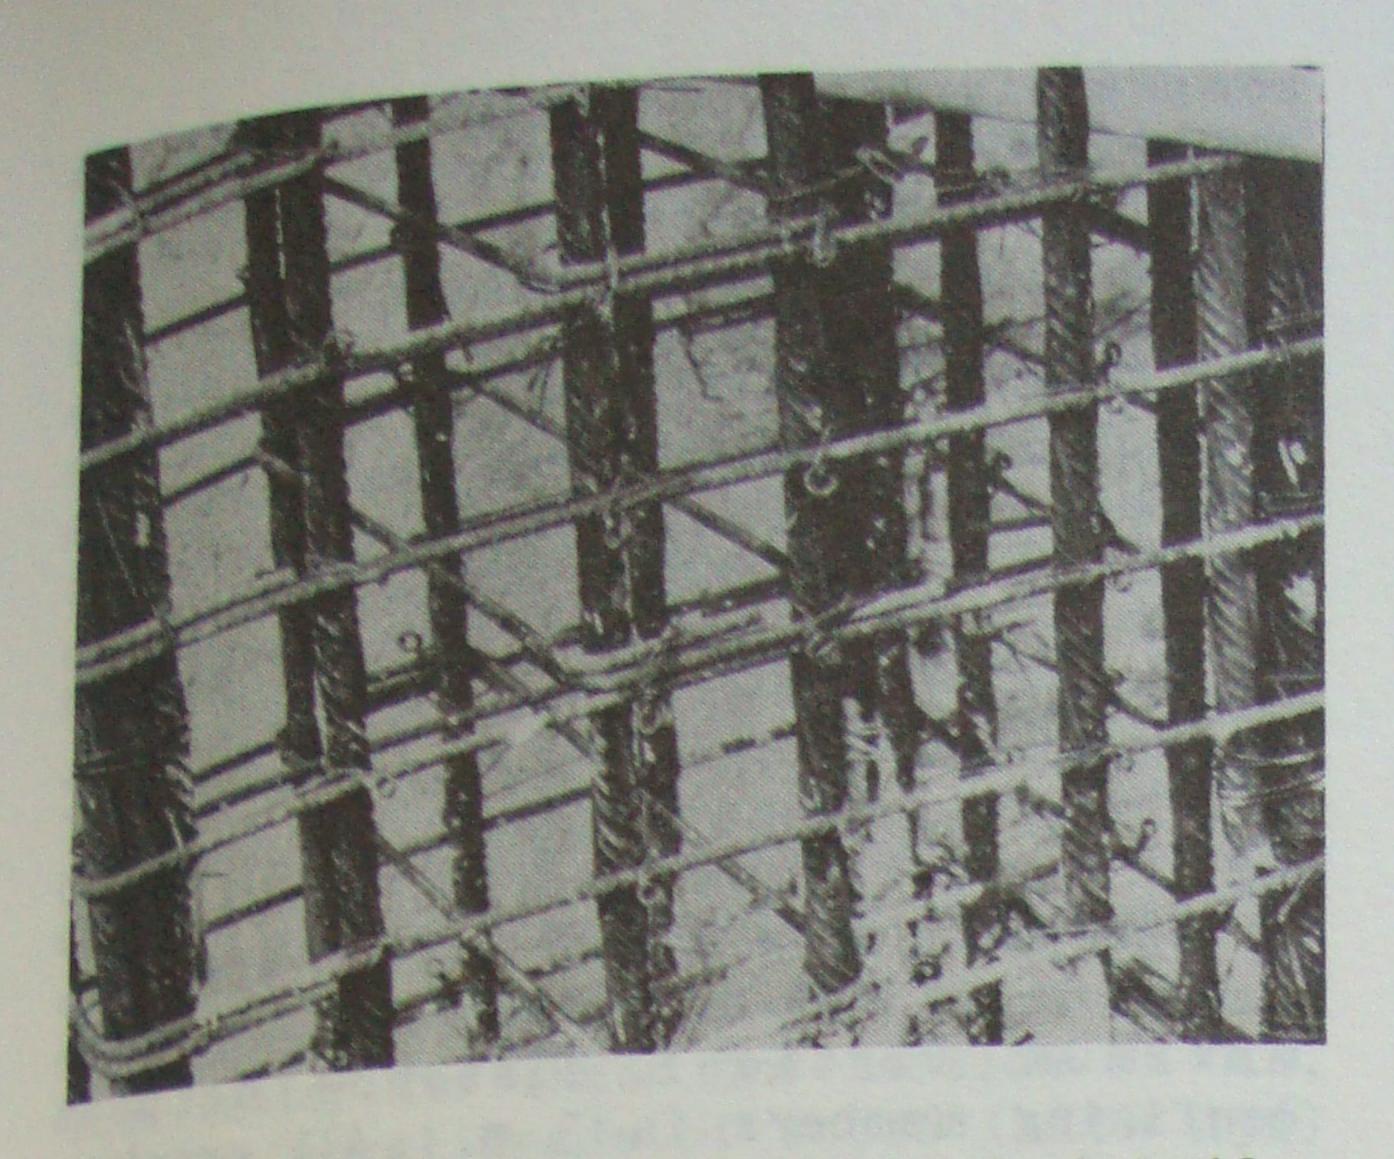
Column reinforcement details with bundled bars (Mitchell et al. 1986a&b).
